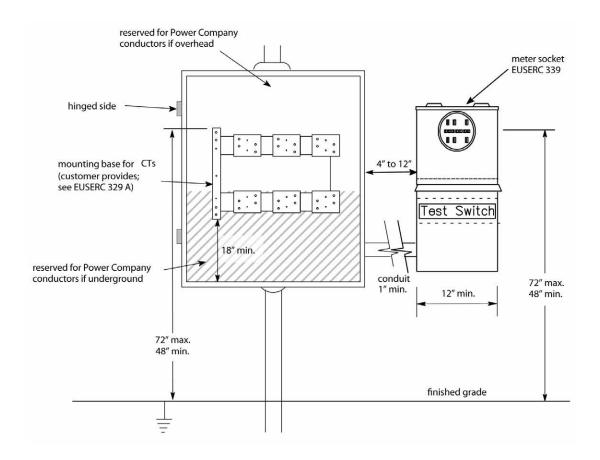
CT Metering, Wall-Mounted, Service Below 600 V, 800 A Maximum
